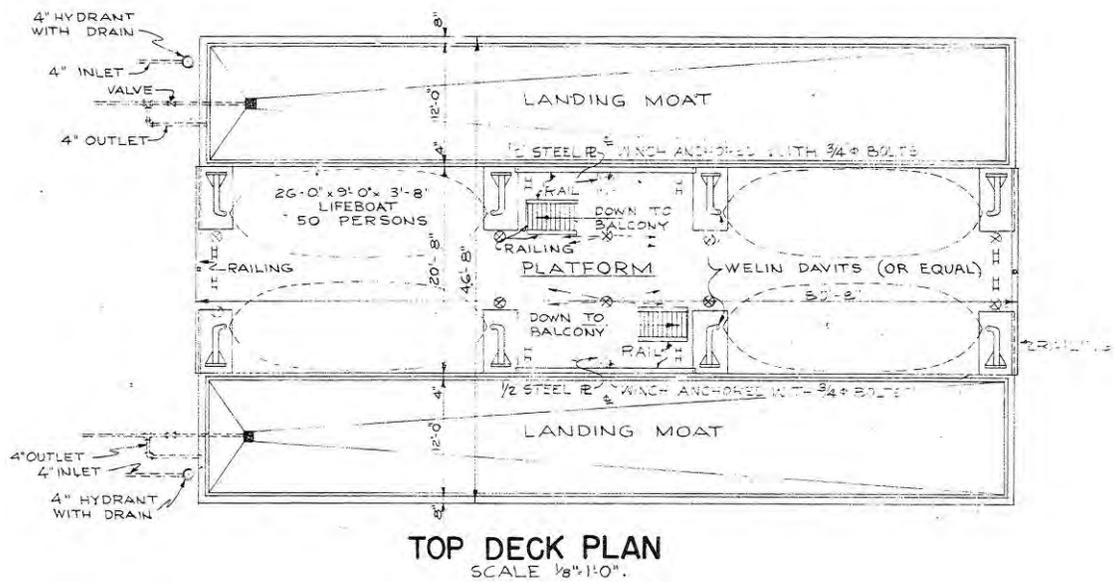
Abandon ship mock-up, top deck plan, Fort Bragg, NC, 1952 (standard drawing 28-13-98 sheet 1 of 3; abandon ship mock-up, plan and elevations; 20 June 1952).
